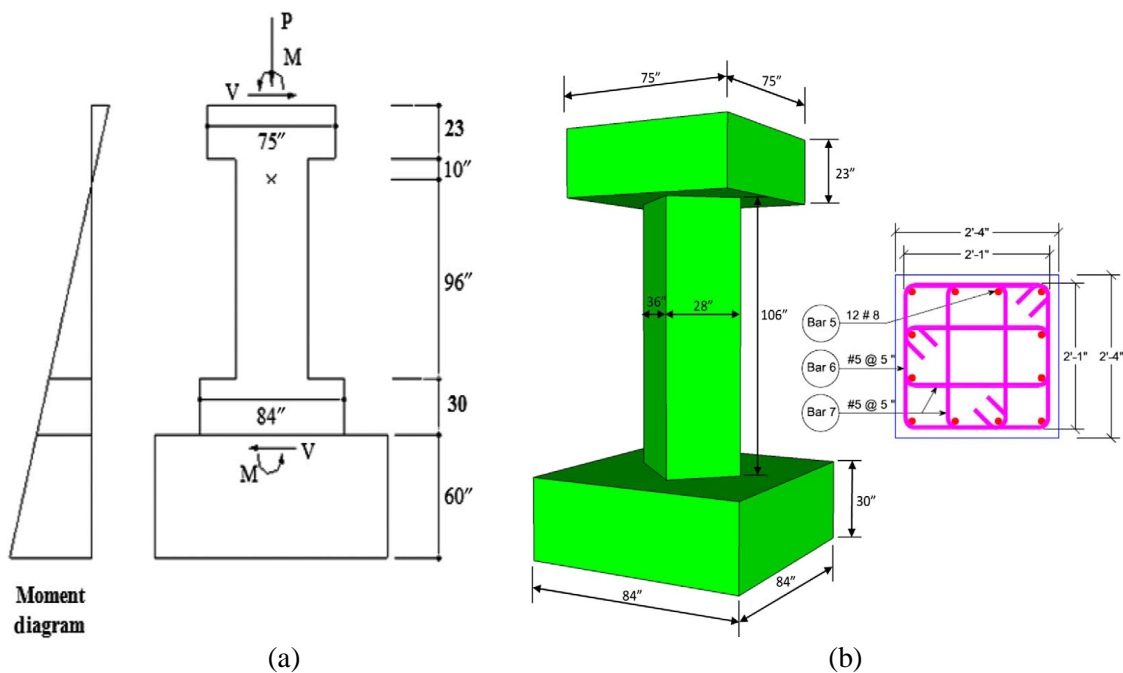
a) locating inflection point and geometry of the specimens, b) dimension and cross section of the specimen (Nojavan et al., 2015)
